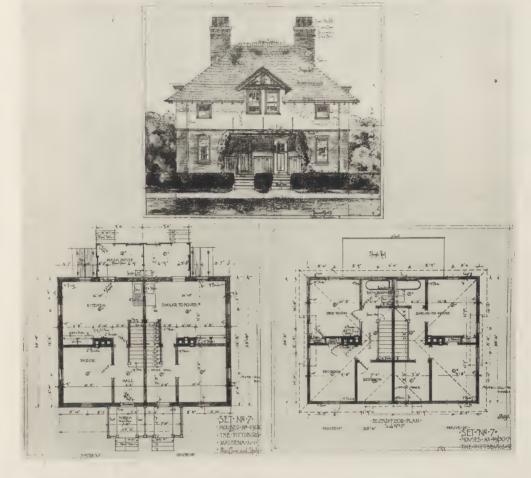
ELEVATION AND PLANS OF TWO-FAMILY HOUSE—ALUMINUM CO. OF AMERICA, MASSENA, N. Y.
